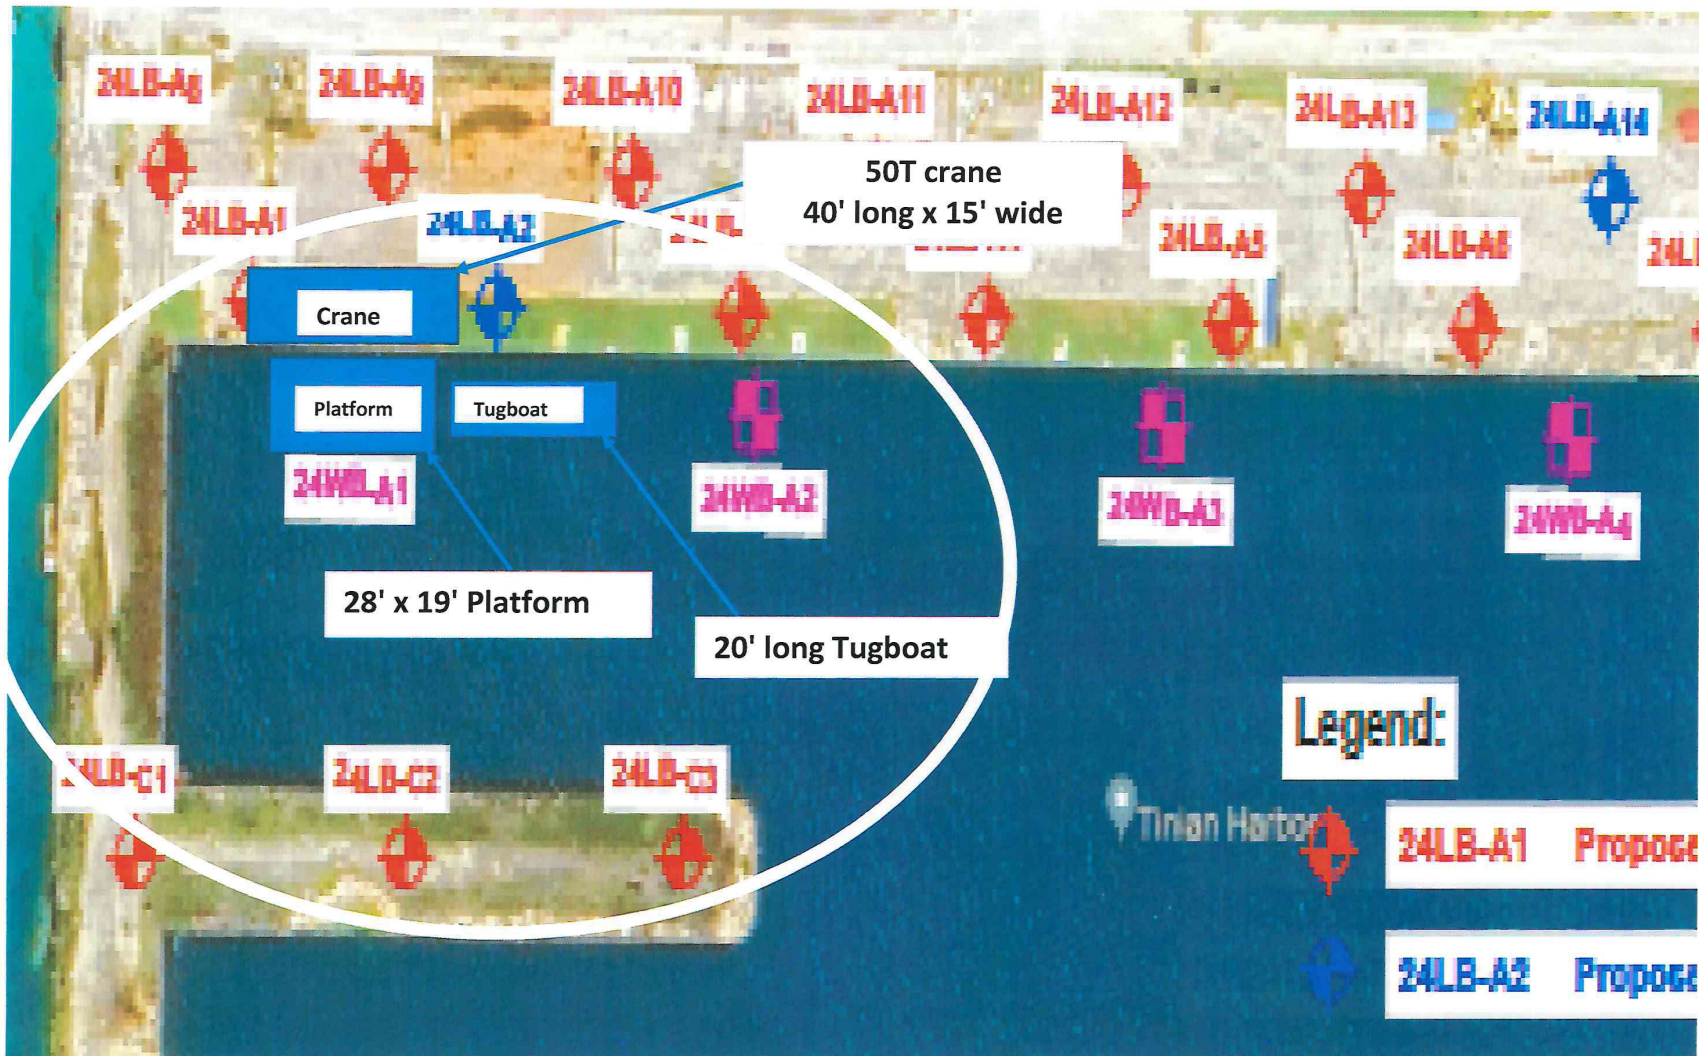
50-ton crane would be positioned on the wharf. Fabricated platform would be placed overwater with the crane. The platform would be supported by the crane as it is transported by a tug boat between each boring site.
